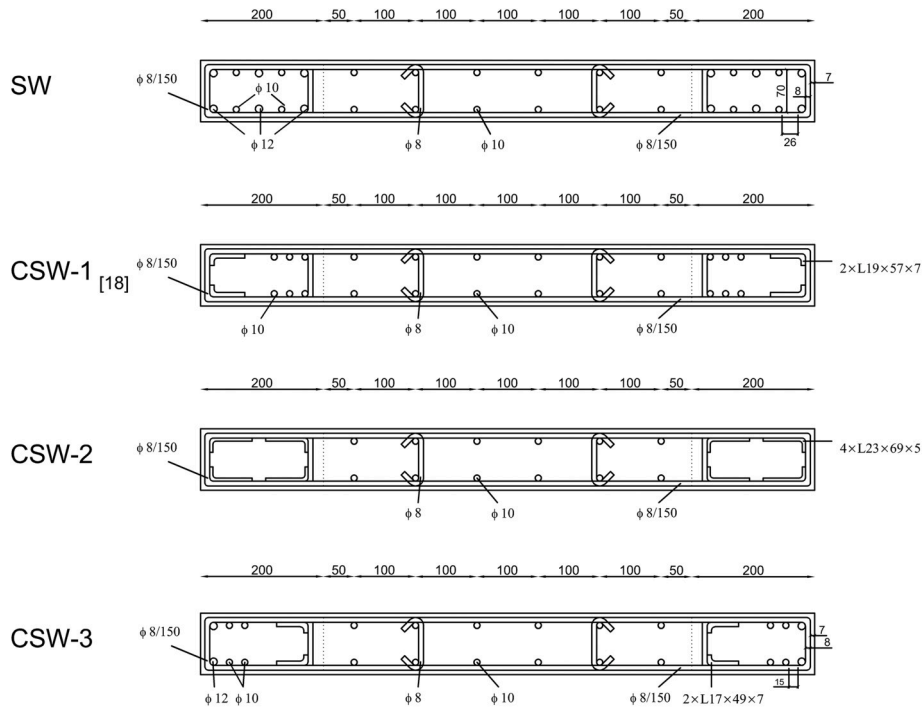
Details of the composite shear walls and conventional RC shear wall (units in mm).
